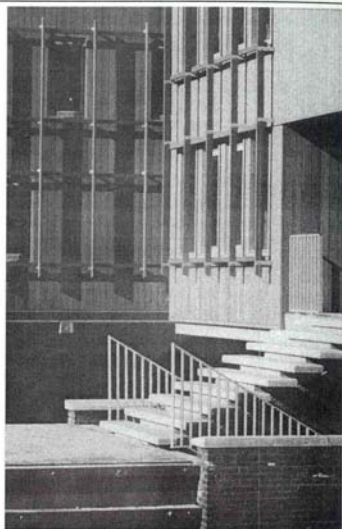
Northside of Water Dwellings, Entrance and timber frames.
